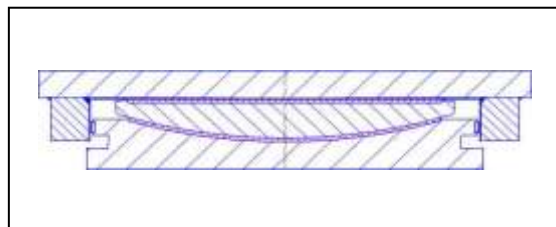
Cross-section of a typical spherical bearing (guided sliding type, with guide bars on sides allowing horizontal sliding movements)
